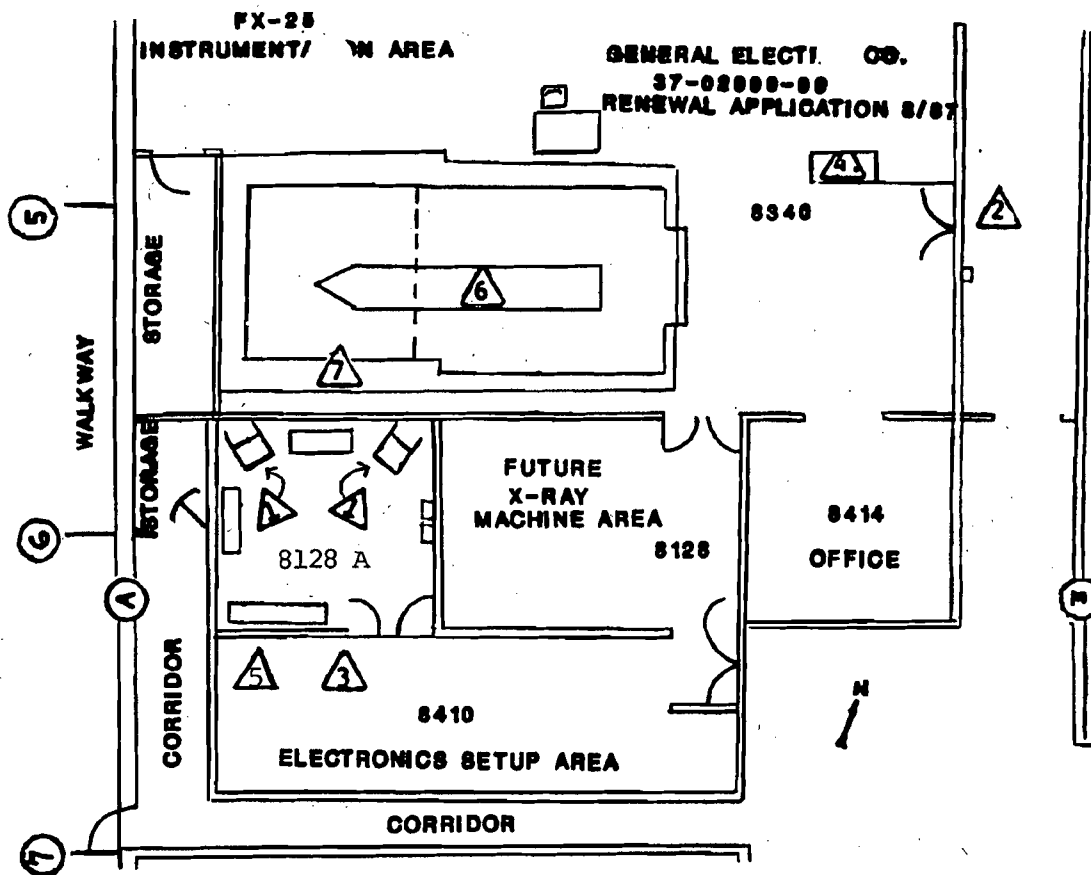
RADIATION LABORATORY FLOORPLAN
